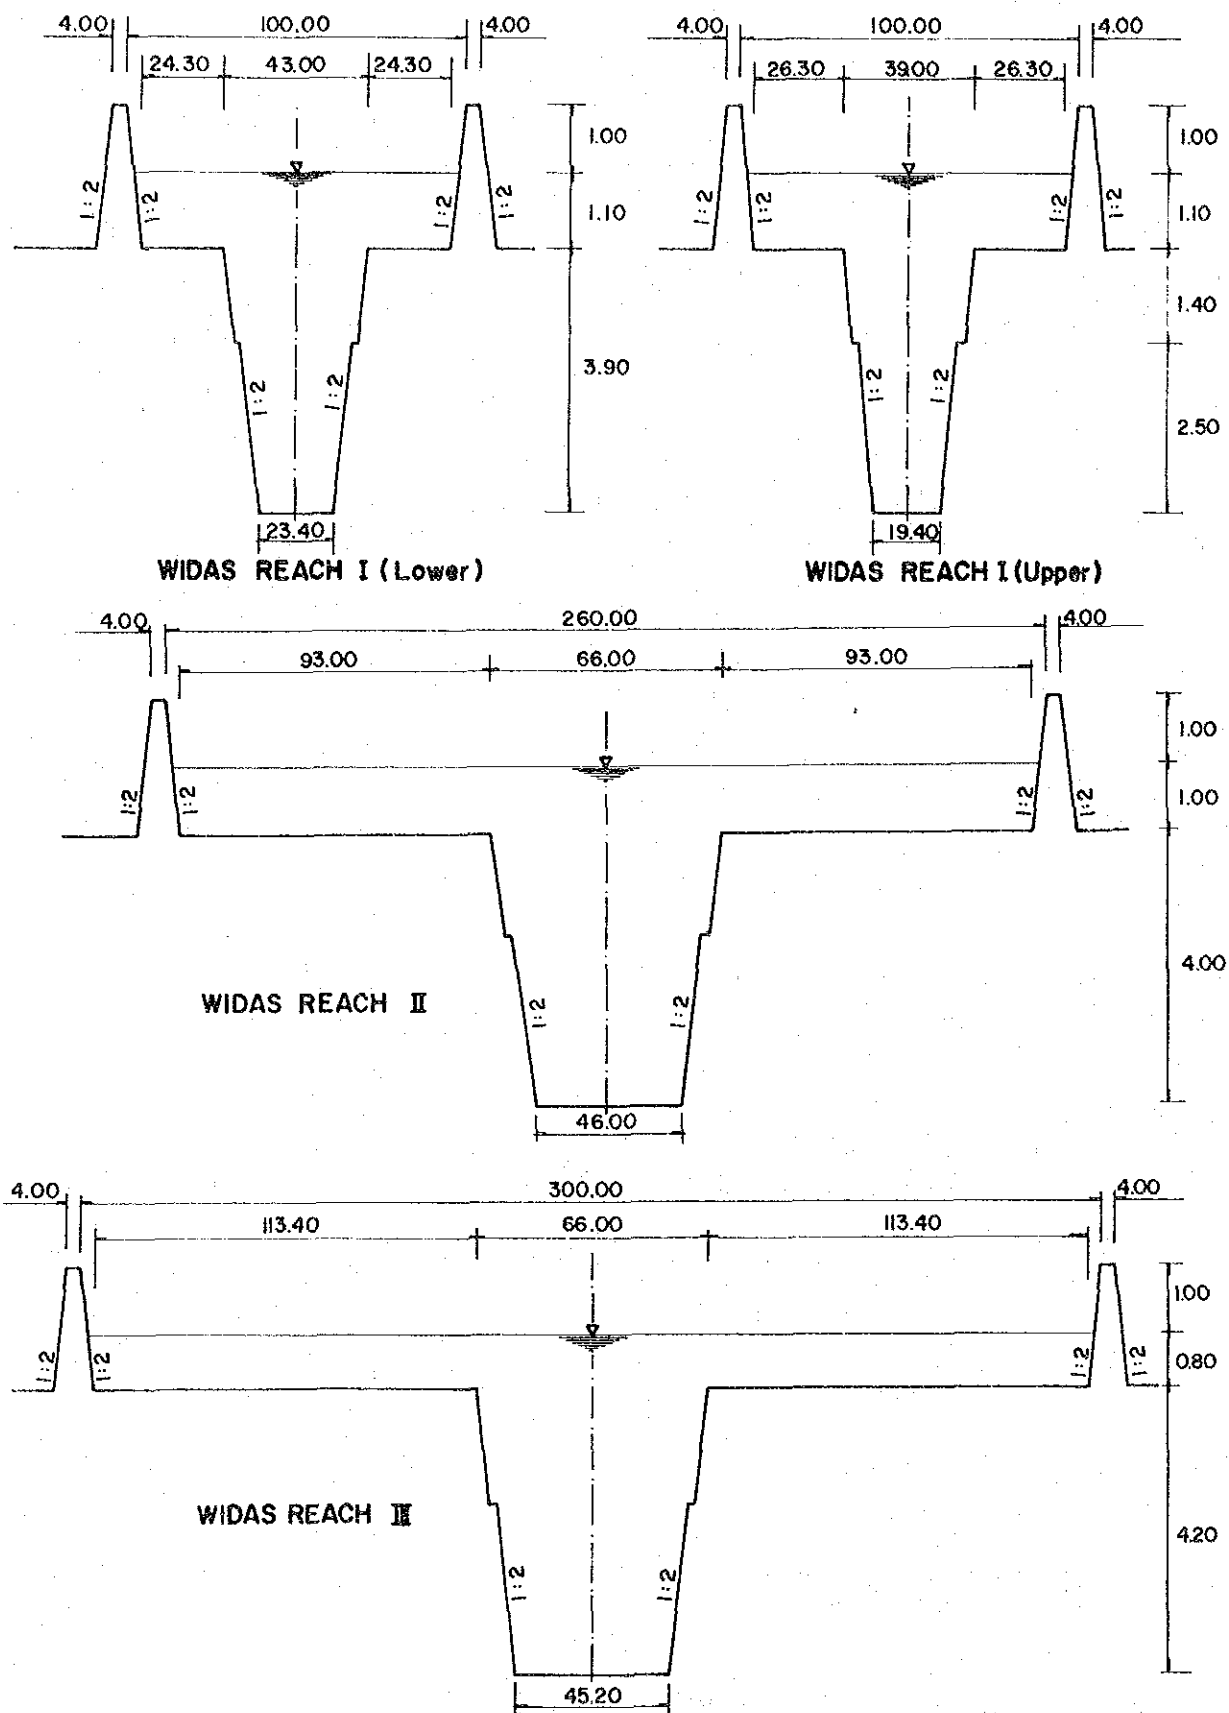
TYPICAL RIVER CROSS - SECTIONS FOR FIRST STAGE PLAN (1/6)
